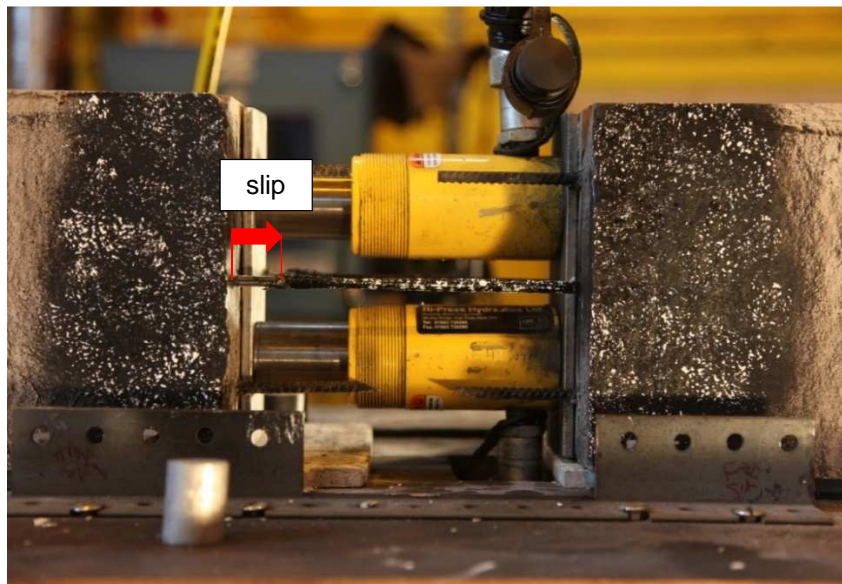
Pull-out failure of specimen with straight reinforcement (specimen S6 at 130°C)
